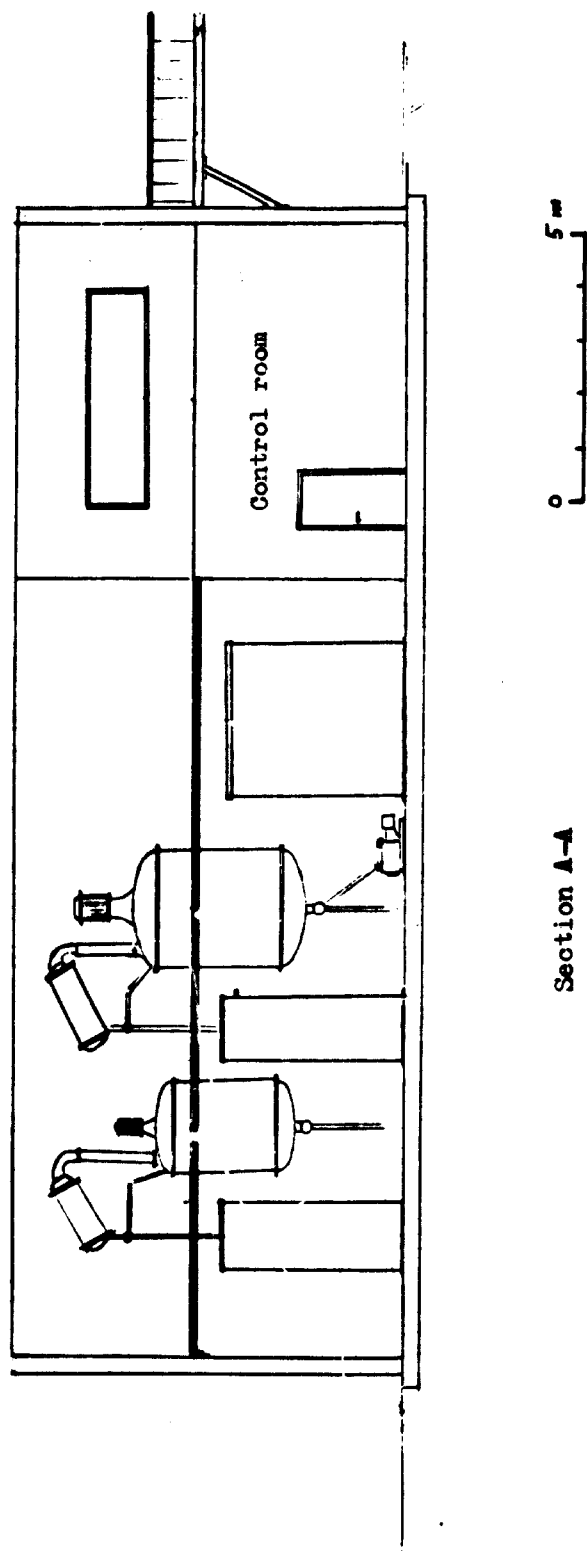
Figure VII. Resin plant: vertical elevation (cross-section of figure VI)
